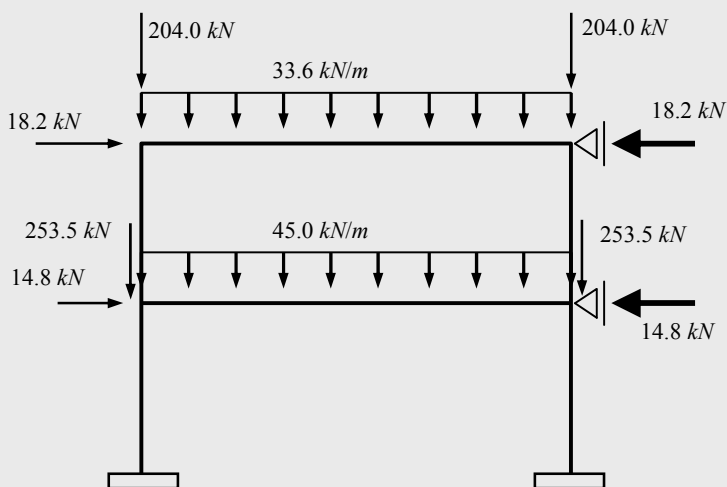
Modified no-sway frame and load arrangement for load combination 1
